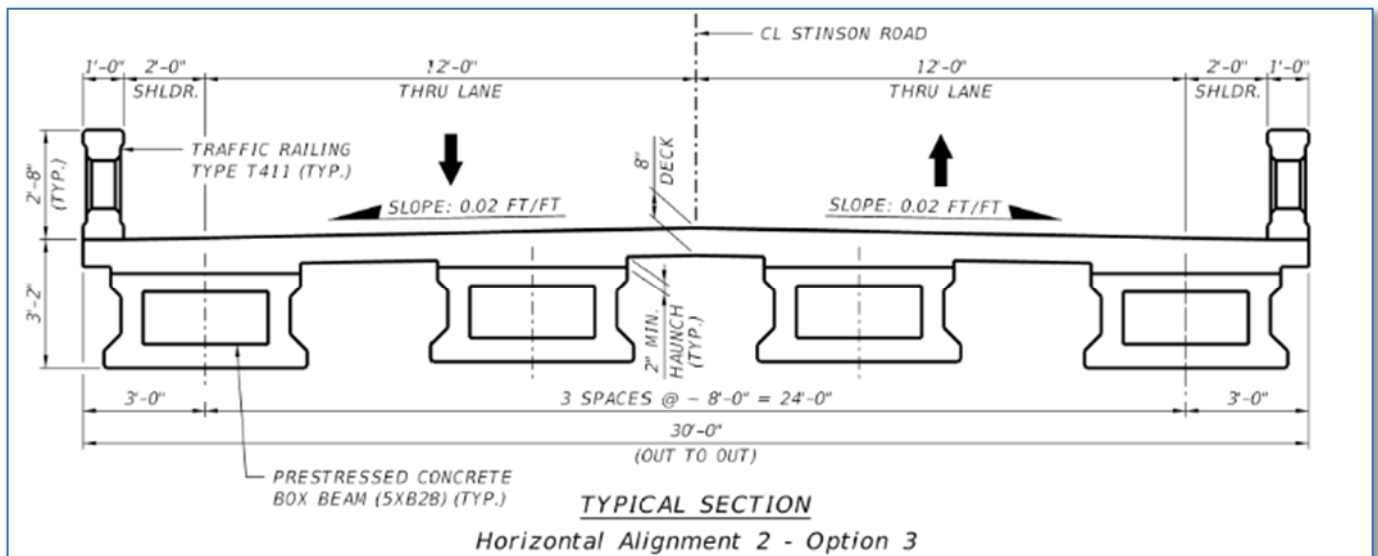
TxDOT Prestressed Concrete XBeams (5XB28) Typical Section
